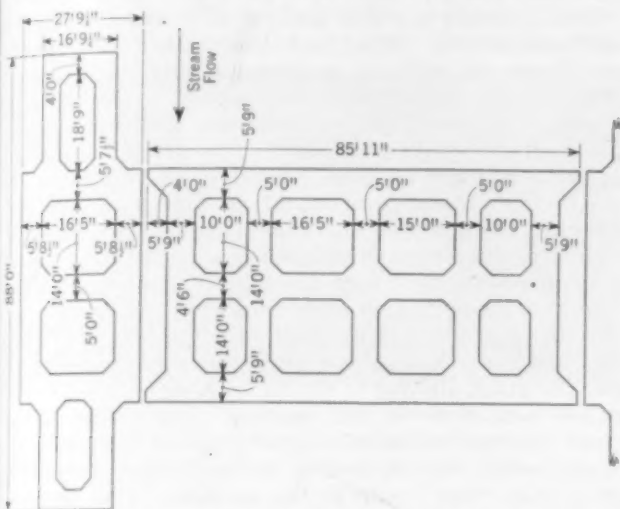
PLAN OF TYPICAL PIER AND SILL CAISSONS
